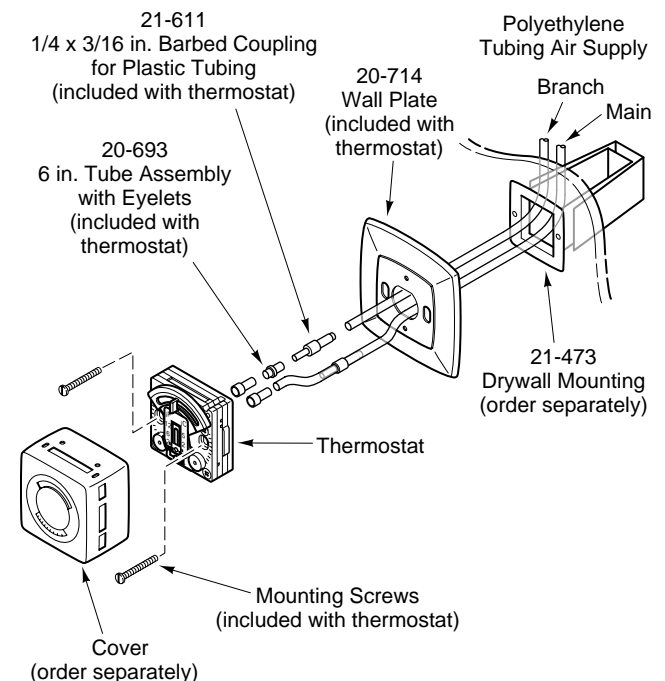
Flush Mounting of Thermostat, Using Drywall Mounting Bracket.
